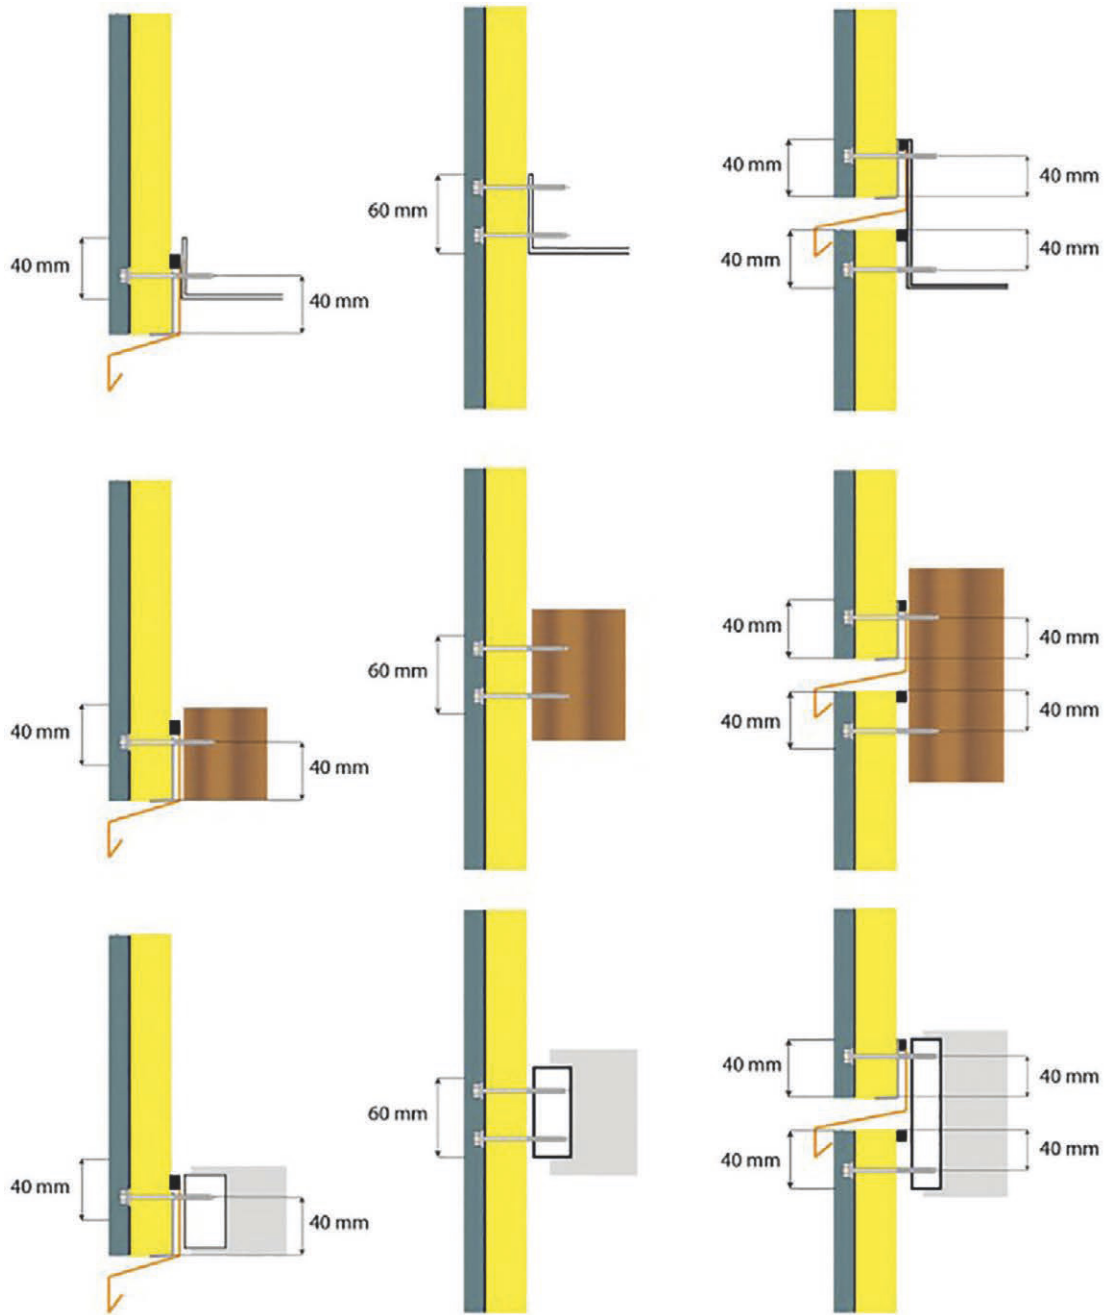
Example of support detail and edge distances for wall panels with hidden fixings installed horizontally on a common steel support
